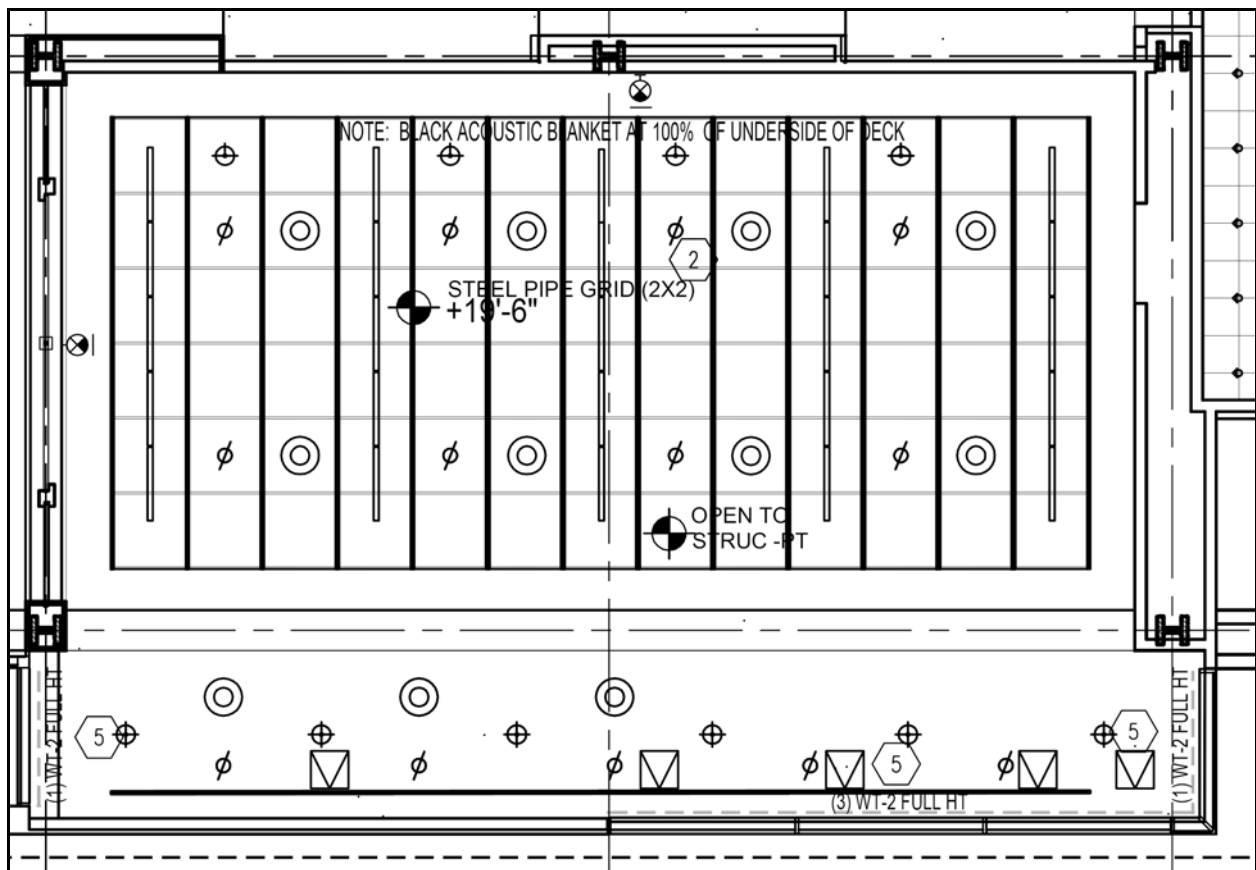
| Multi Purpose Room Reflected Ceiling Plan – Existing Design [Not to Scale]
